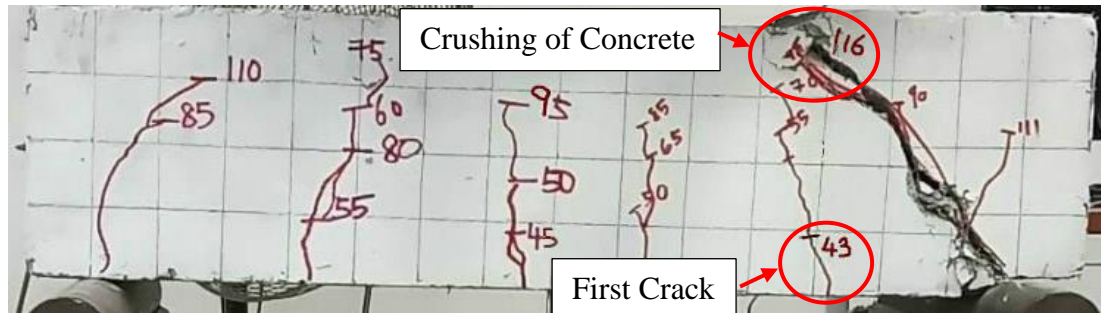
First Crack and Crushing of SFRC-0.6 Beam
